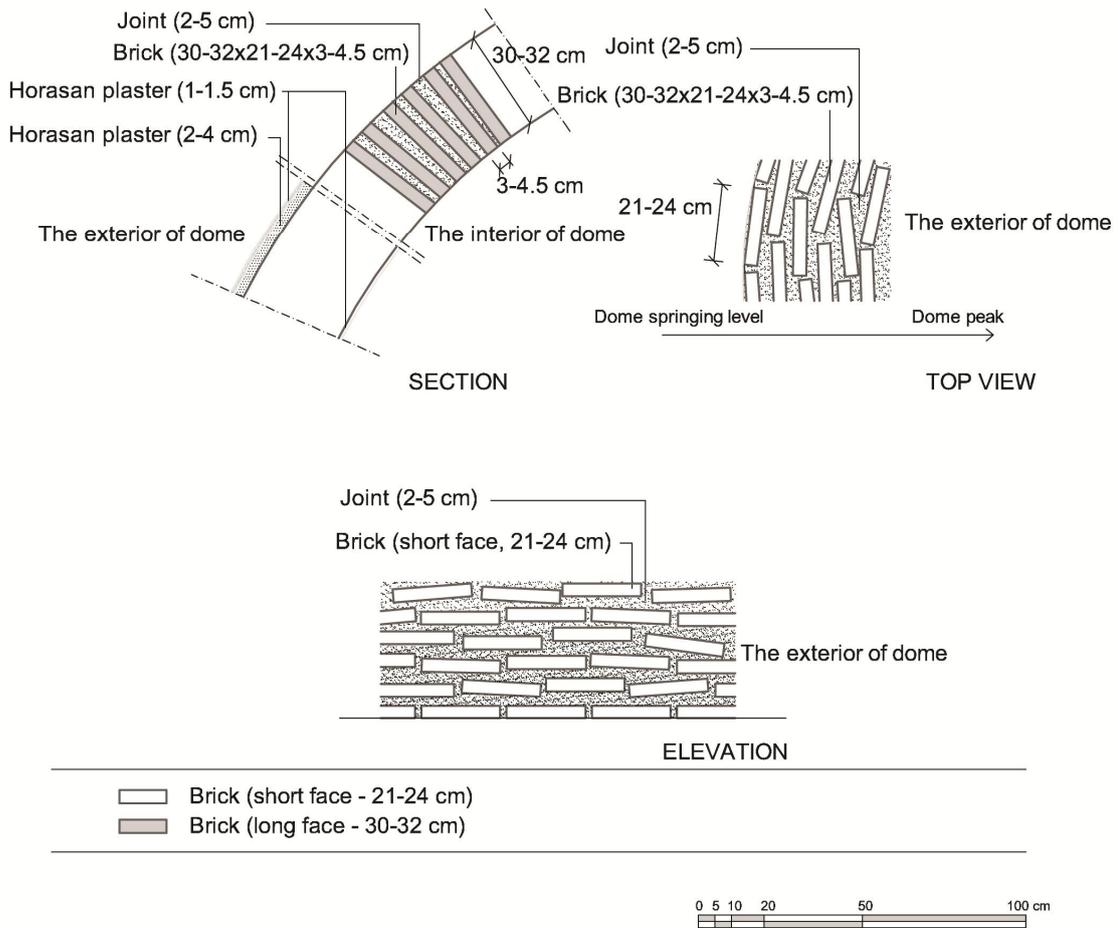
Drawings of the bond type of “horizontal stacking of the short side faces in places non-parallel rows”.
